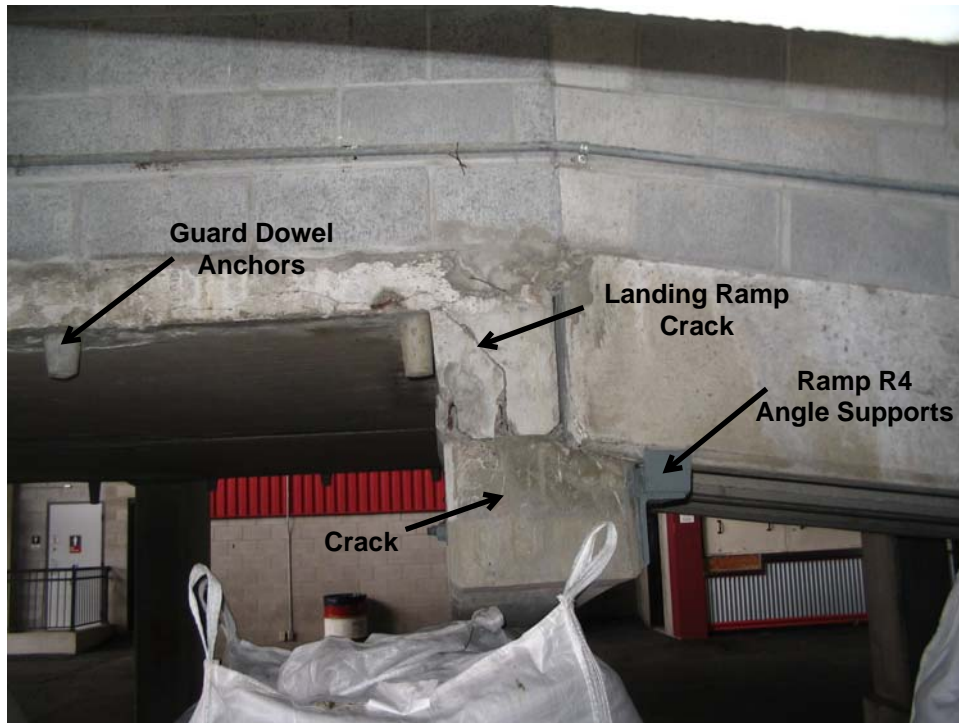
Ramp Column End View: Guard rebar anchors; Landing slab cracks; Ramp column cracks; Ramp R4 bearing support previous repairs
